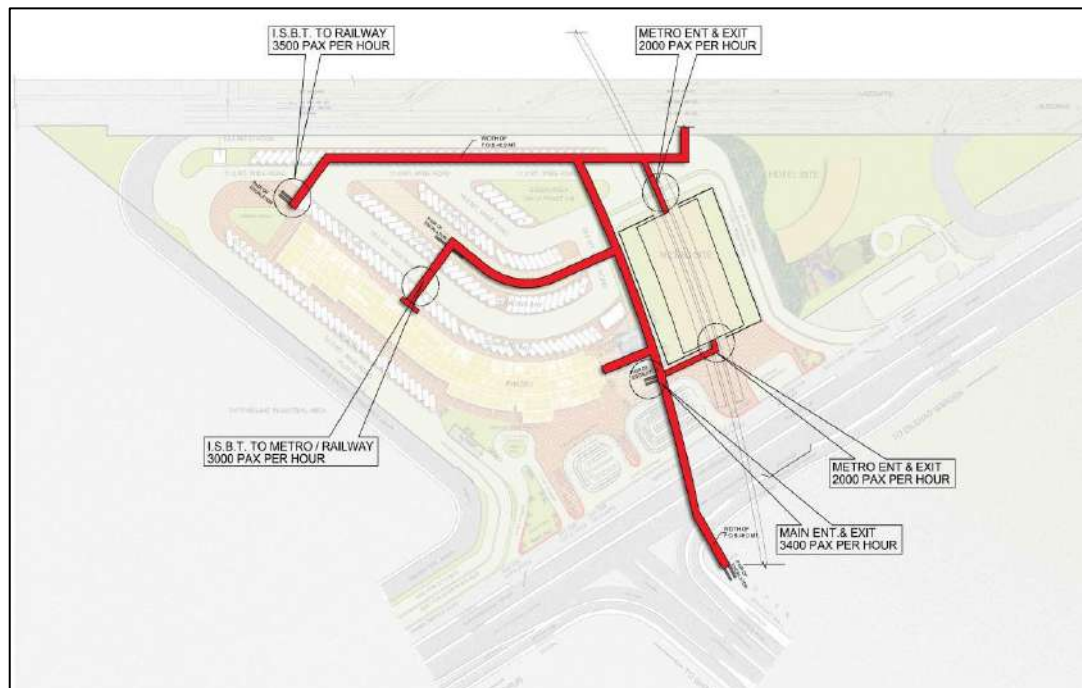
Proposed ISBT - Planned Foot Over Bridges
